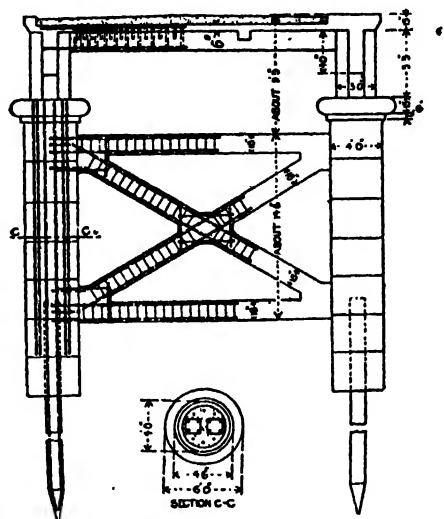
e*.—Braced Bent of Reinforced-Concrete Cylinder Piers.
